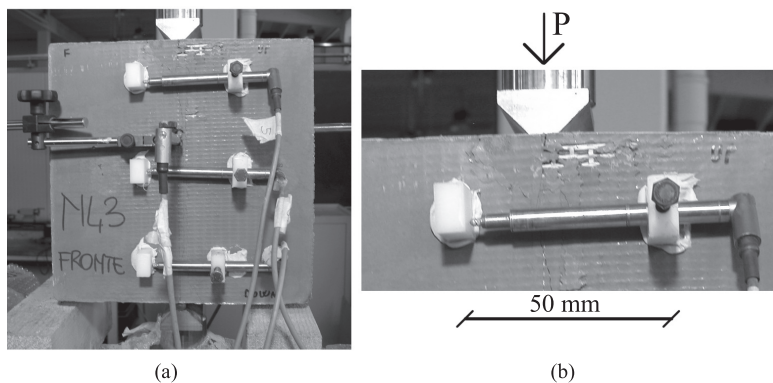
DEWS test on TRM  $w=0$  mm (a) multicracking zone, (b) detail
